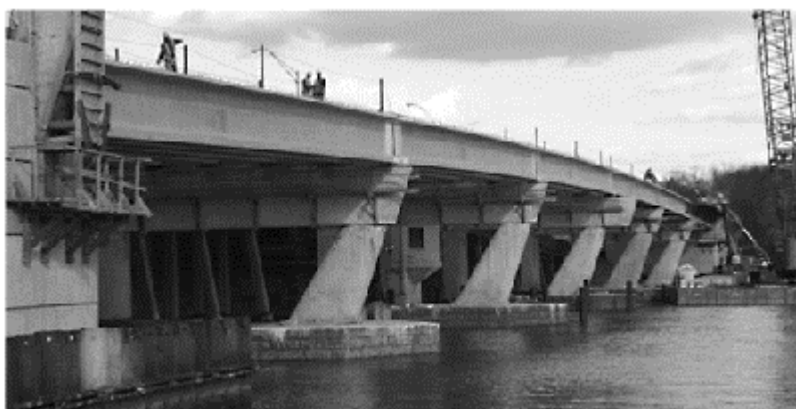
Eastbound bridge piers 1 through 5 have been completed.
